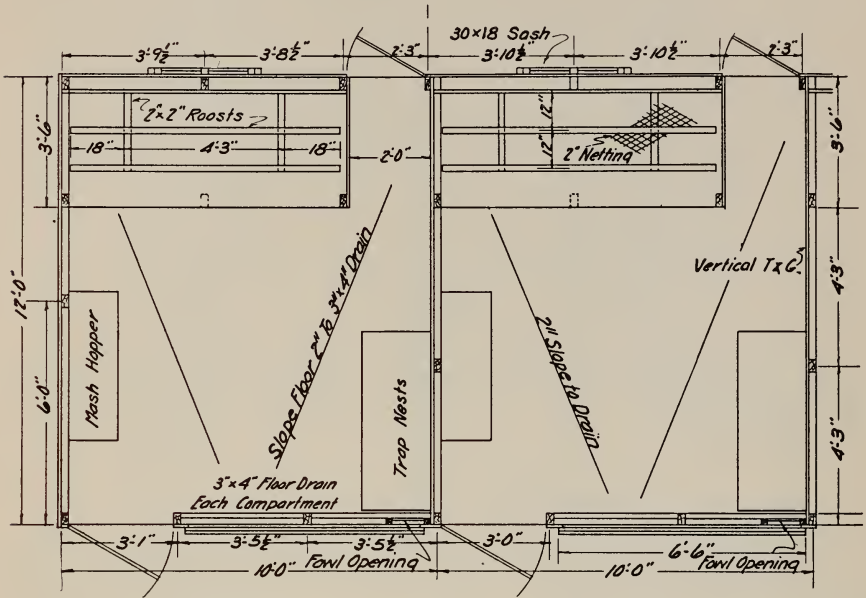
Floor plan of breeding house showing arrangement of doors, roosts, curtains, nests, etc.
